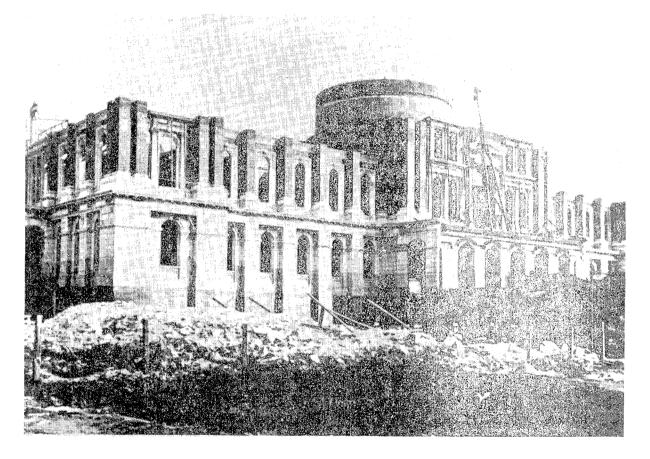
CONSTRUCTION SCENE, CIRCA 1867
